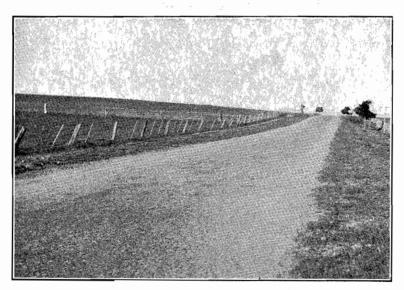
Hume Highway, near Beveridge, after reconstruction.
